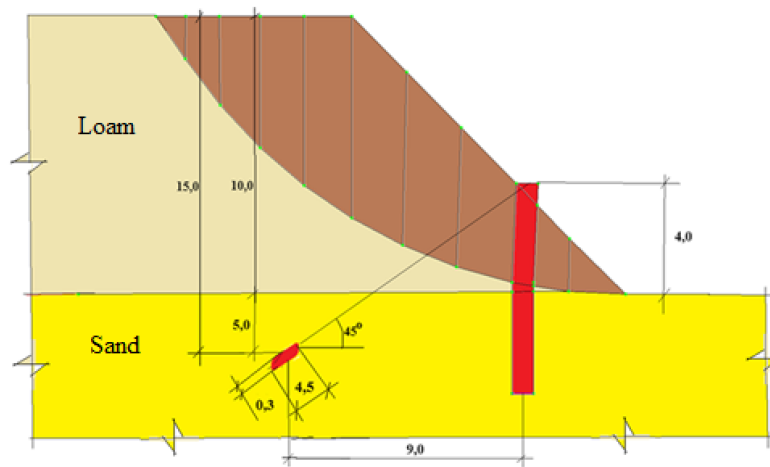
Relative arrangement of the landslide, retaining wall, and ground anchor
